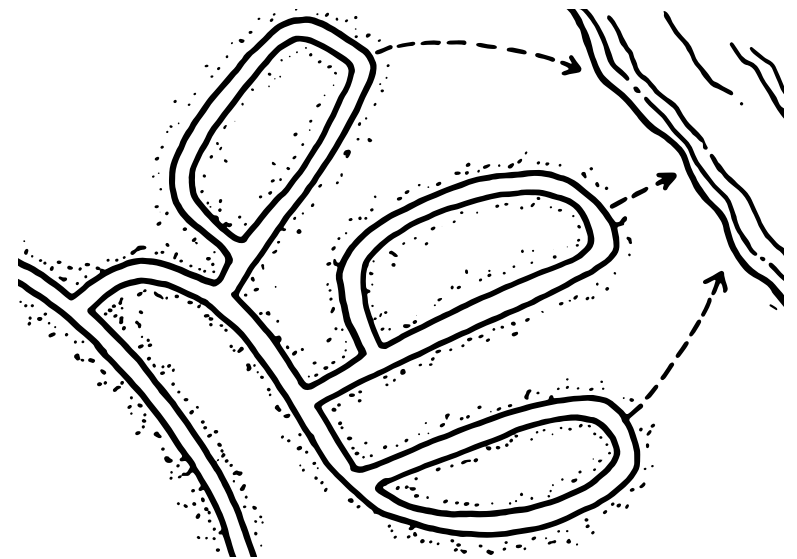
A proven campground road configuration provides campsites off individual loop roads linked by a central access road. Loop roads can also provide managed access to natural destinations, such as shoreline.
